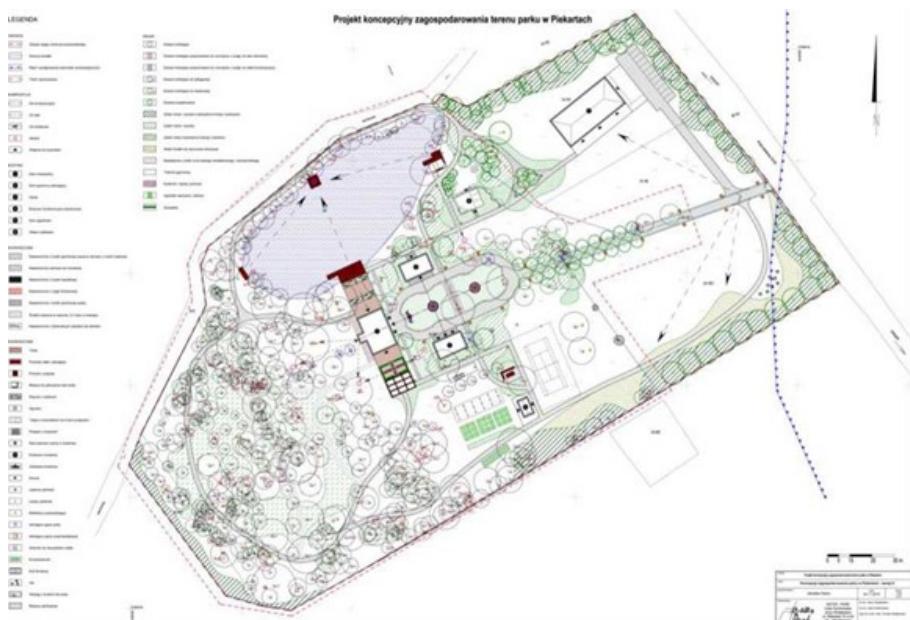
Design plan featuring a new building on the site of the manor house (aligned with the access avenue), preserved teachers' residence and an additional building to complete the symmetrical design of the access avenue; the former schoolhouse is not preserved
